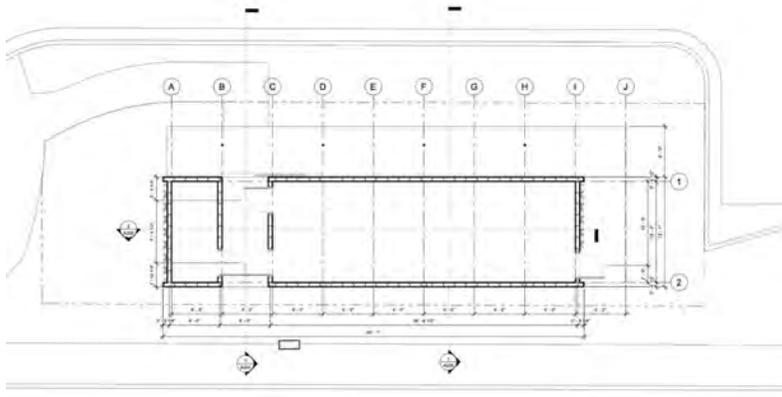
Ground Floor Plan: KSU Mini Pavilion with Dimensioned Structural Grid (Michael Carroll 2022)
